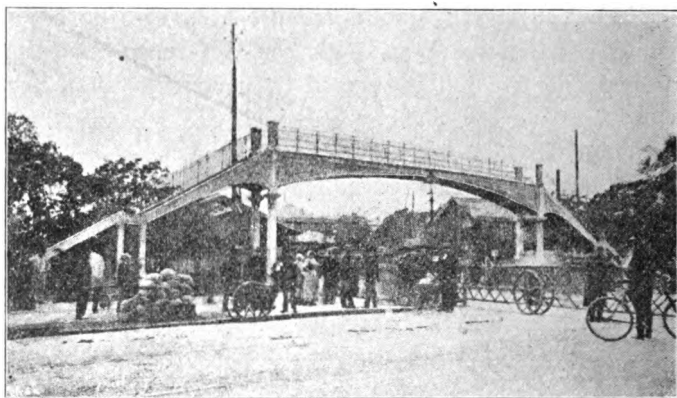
Foot Bridge over Railroad, 60 ft. span.
